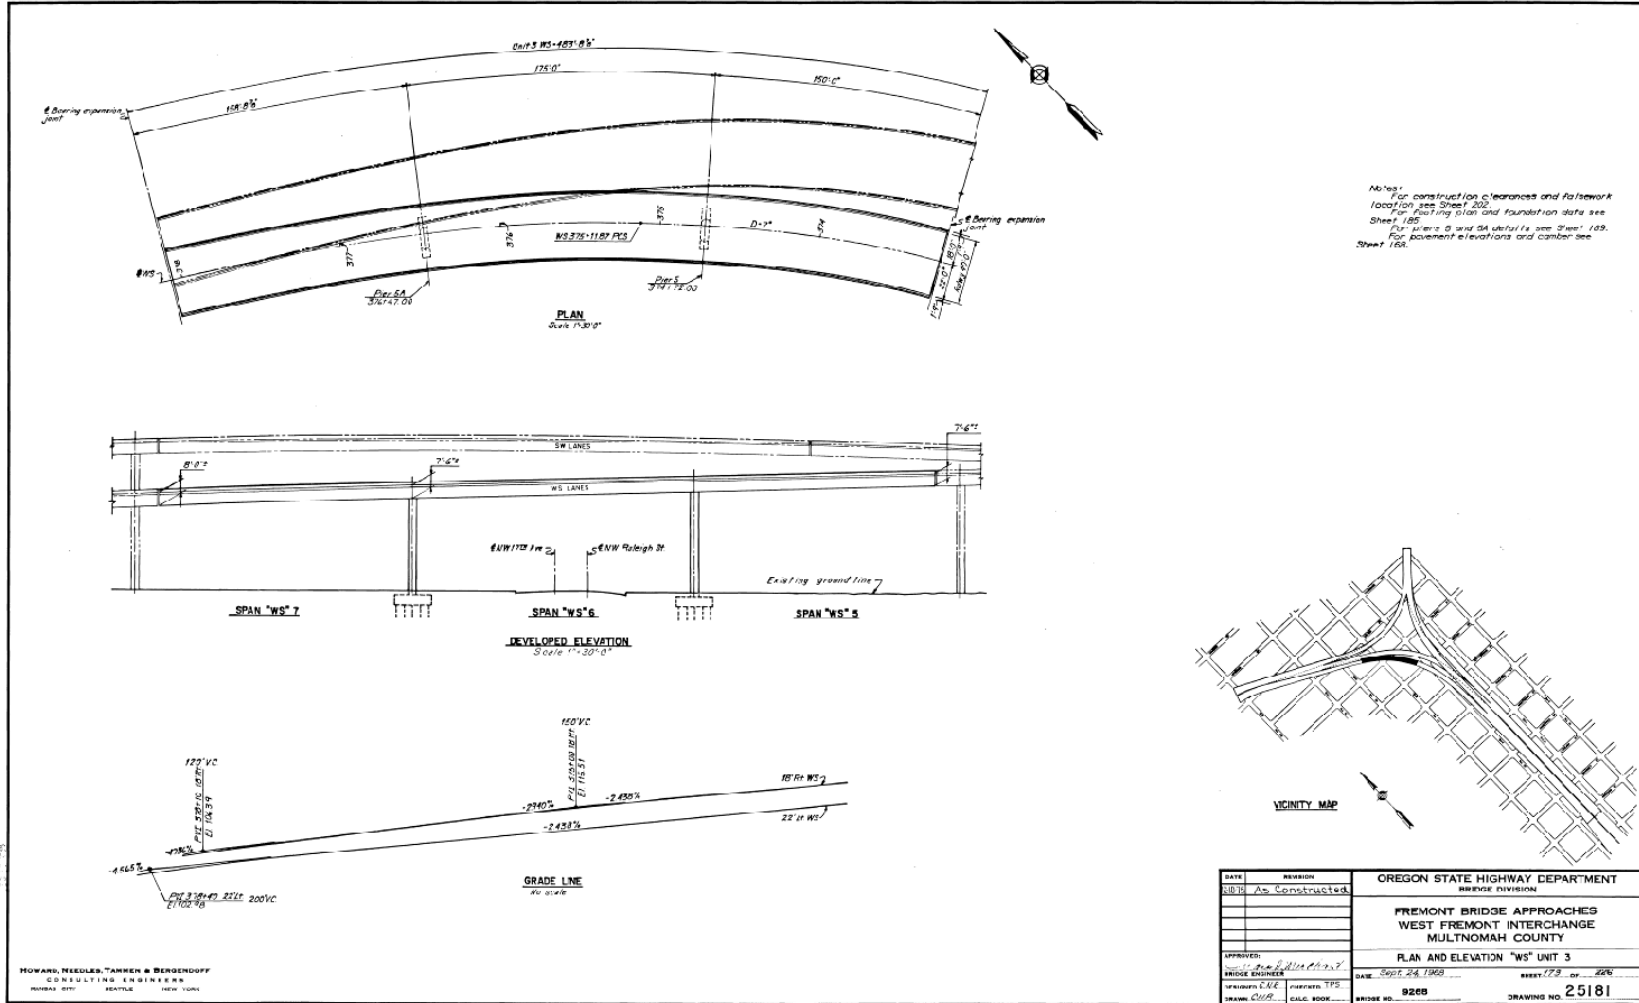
Plan and elevation views of WS Unit 3 Bridge superstructure 09268B.
